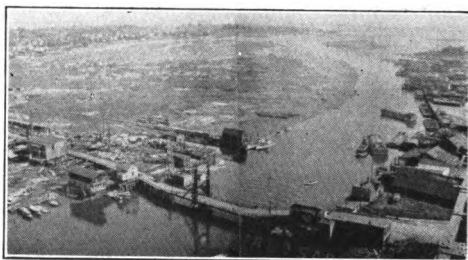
Temporary bridge in service: old bridge removed. Washington Street Bridge, Norwalk, Conn.
